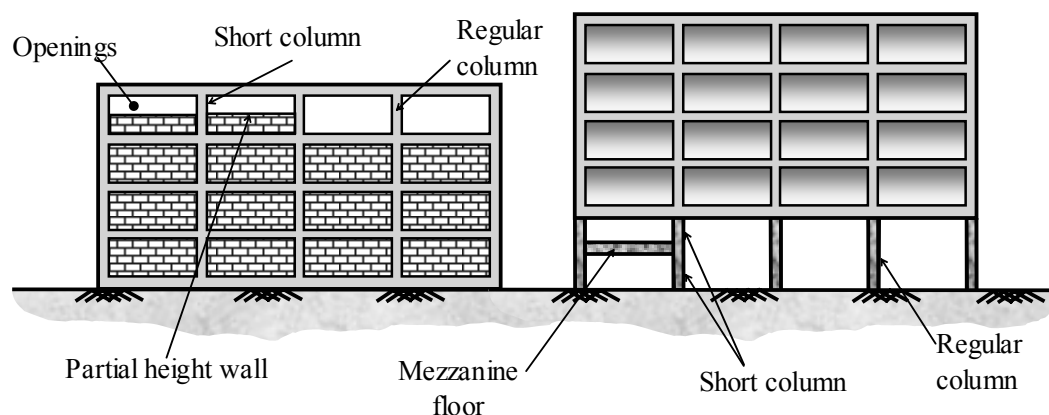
“Short column” effect due to openings in masonry infill walls or mezzanine floor (Ref. 0.16)
